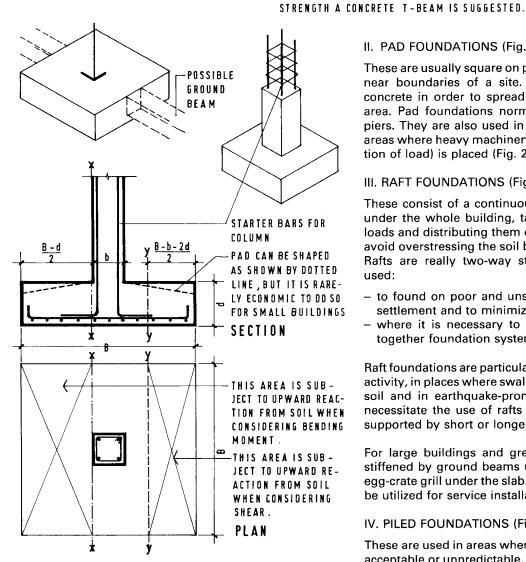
PAD FOUNDATIONS (ADAPTED FROM "FOUNDATIONS" BY V.C.LAUNDER, MACMILLAN, LONDON).
